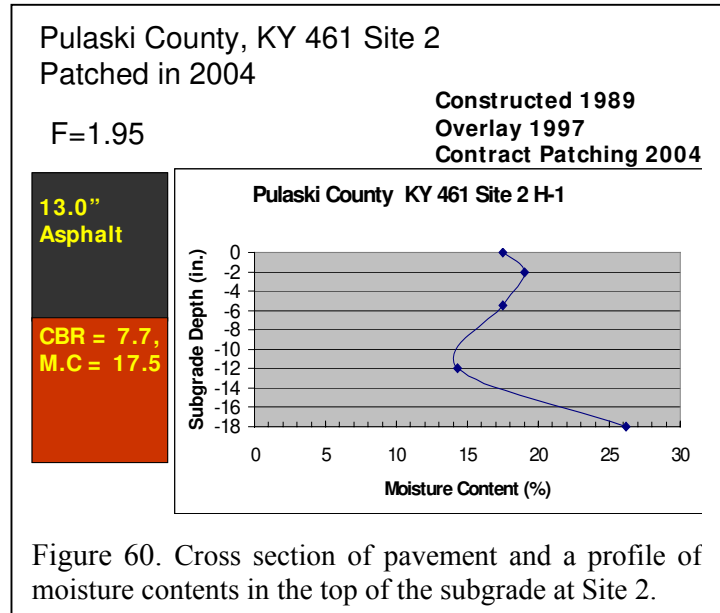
Cross section of pavement and a profile of moisture contents in the top of the subgrade at Site 2.
